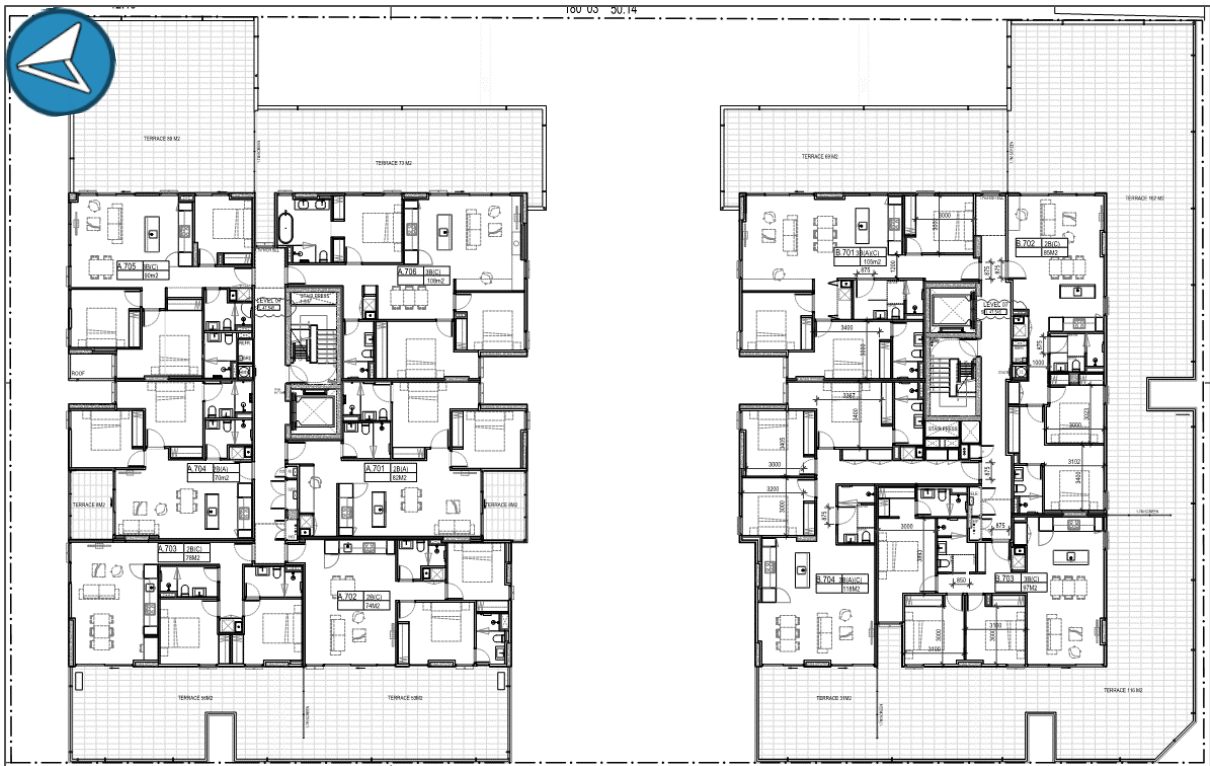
Proposed Floor Plans – Level 7 (Image Source: Artisan Architects)
